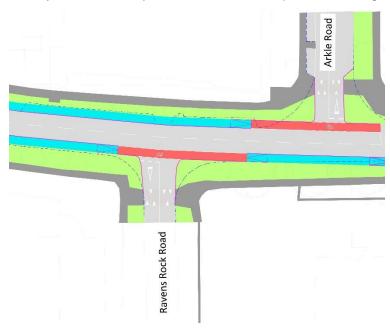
Junction 1: Ravens Rock Road / Carmanhall Road
